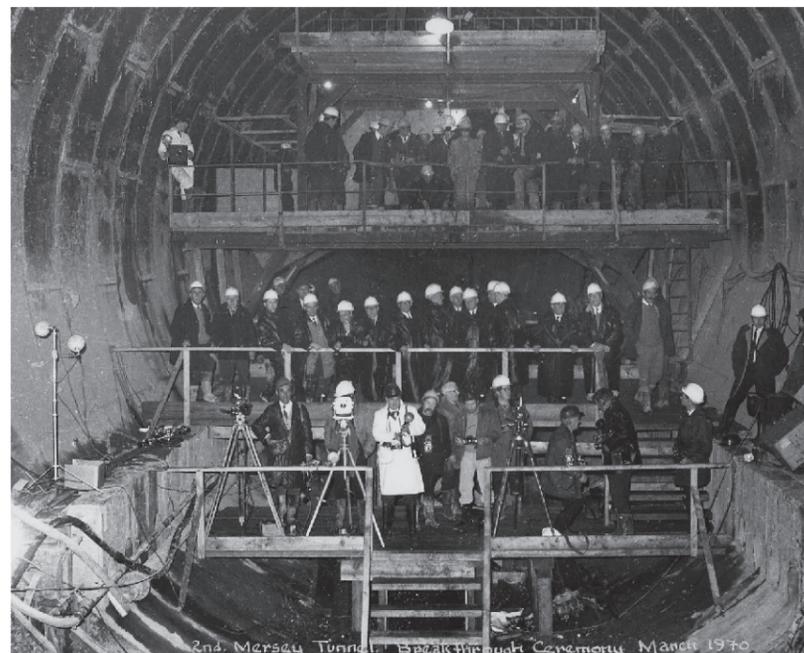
Kingsway Tunnel, Breakthrough Ceremony (1970)
